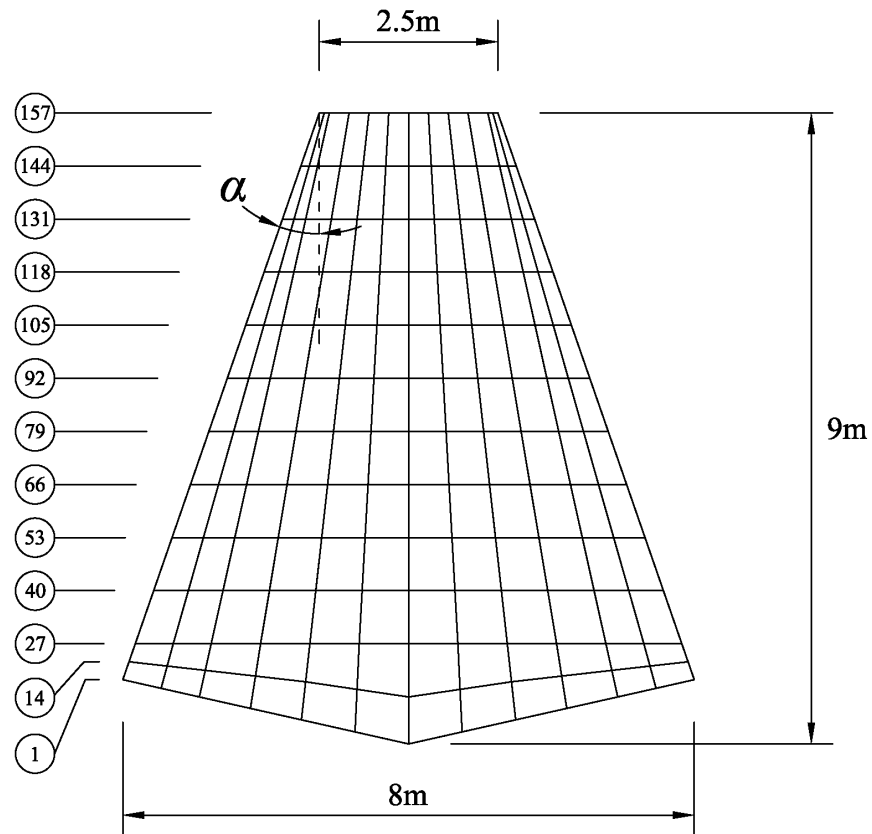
Geometry and layout of the non-orthogonal slab example
